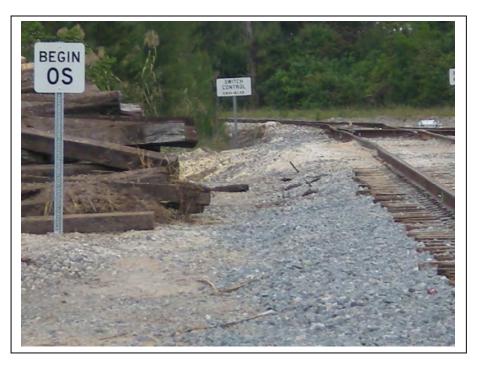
December 5, 2008 ROW 126 ft from overhead bridge looking Northwest
